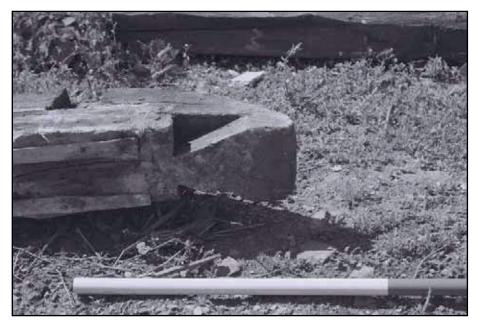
Detail of lapped dovetail joint on tie beam from East Range (film 8.15)
